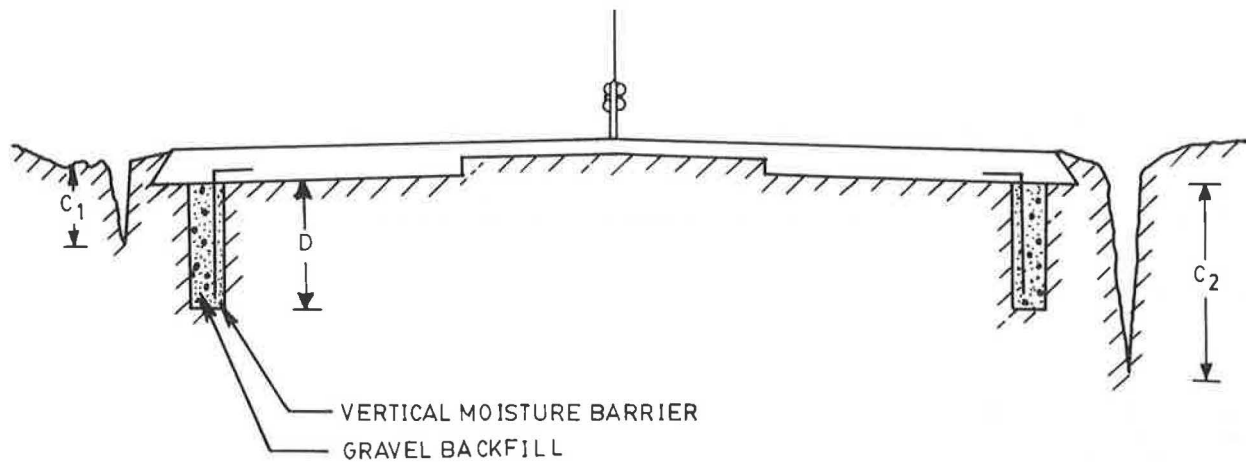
Sketch of a highway cross section with a vertical moisture barrier.
